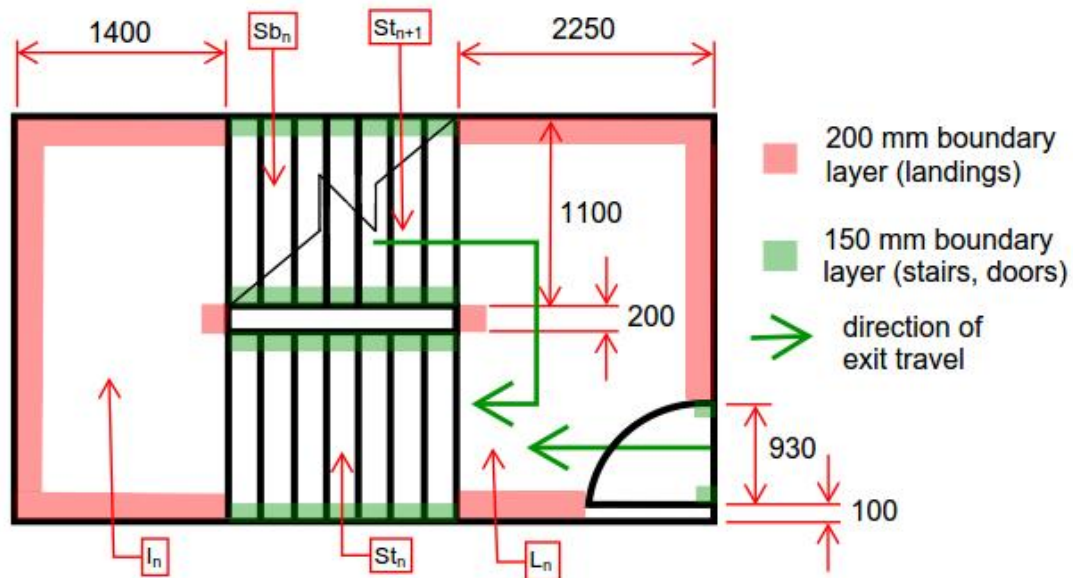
Plan of exit stair at level n , with dimensions shown in mm
